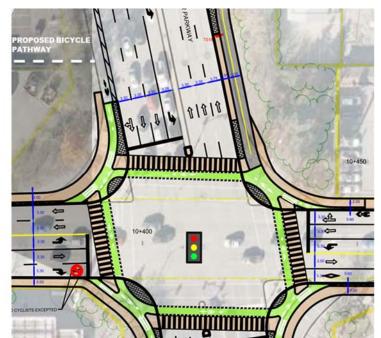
Conceptual Design Plan for the Montreal Road / Vanier Parkway Intersection
